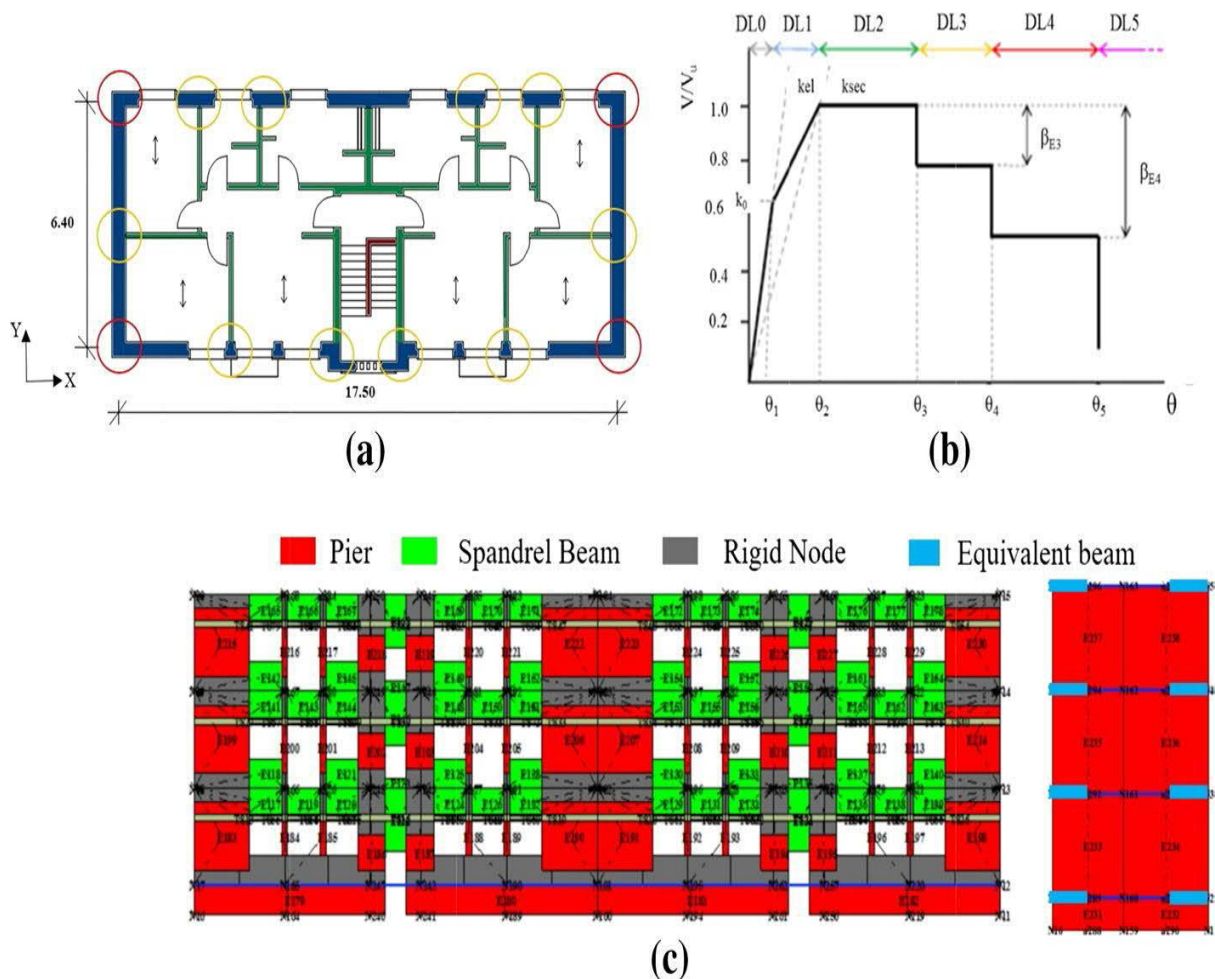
(a) plan showing the position of the bad connections between walls; (b) multilinear constitutive law for masonry panels; (c) comparable casing glorification of the front façade (left) and the wall showing the beams adopted to understand the effectiveness of wall-wall connection (right)
